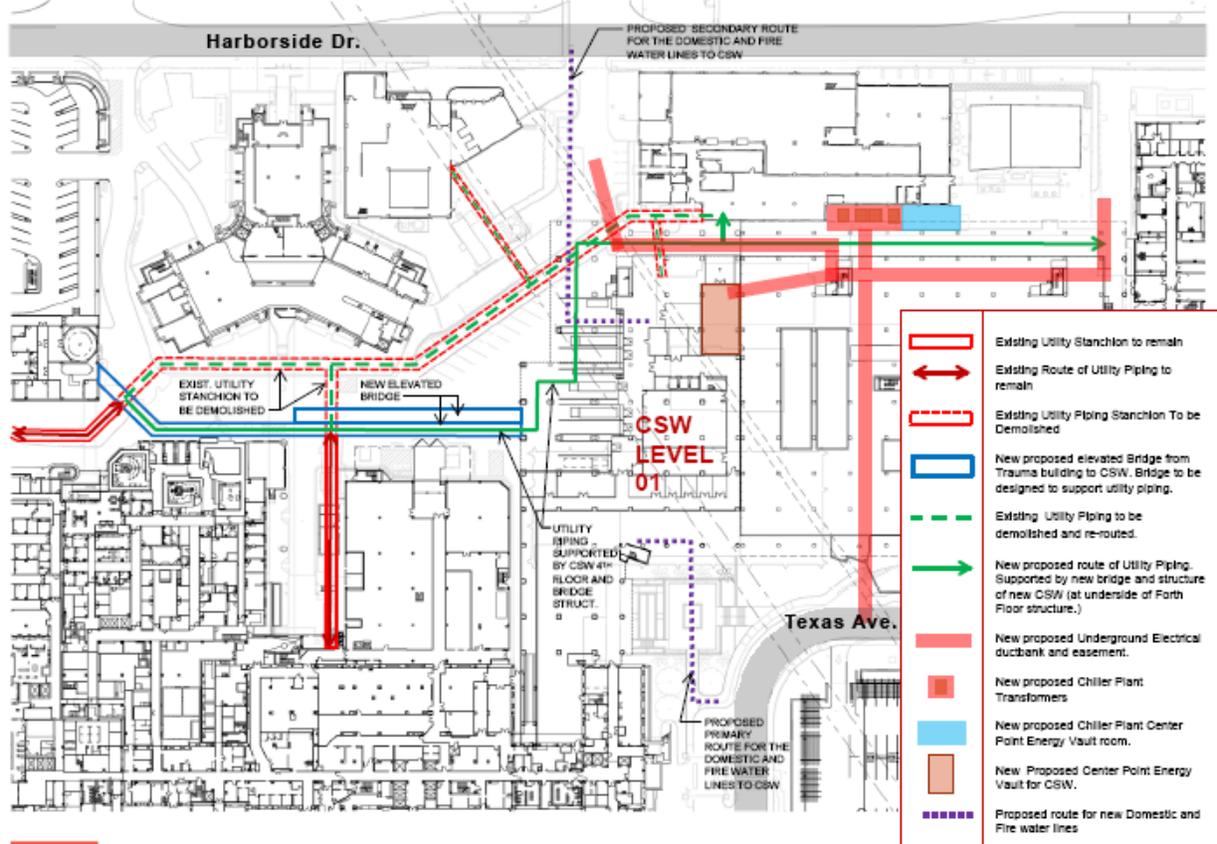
Proposed Utility Site Plan for CSW and Surrounding Area
